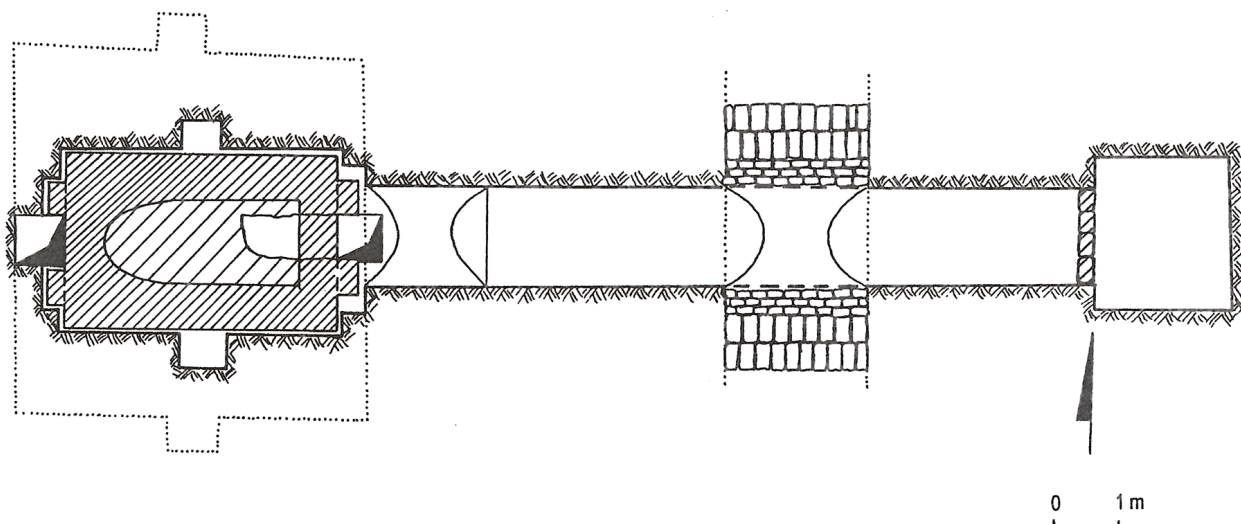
The tomb of Udjahorresnet, plan of the substructure (after Bareš 1999, 73).
